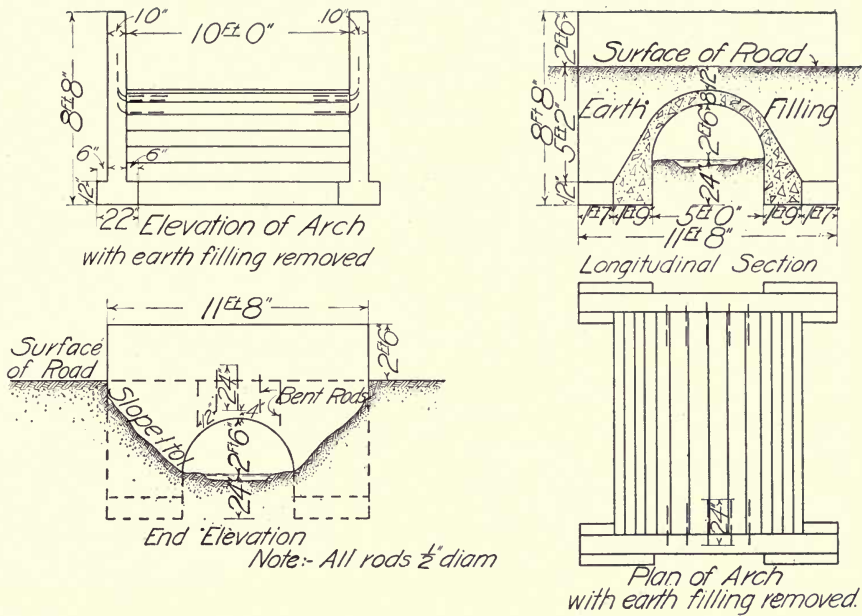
ARCH CULVERT FOR FIVE-FOOT SPAN.
